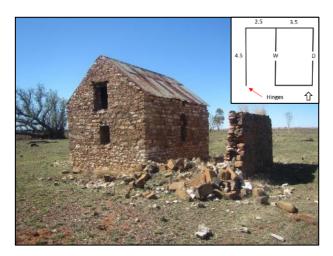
Stone ruin at waypoint 294. Inset: plan view showing door hinge location.
